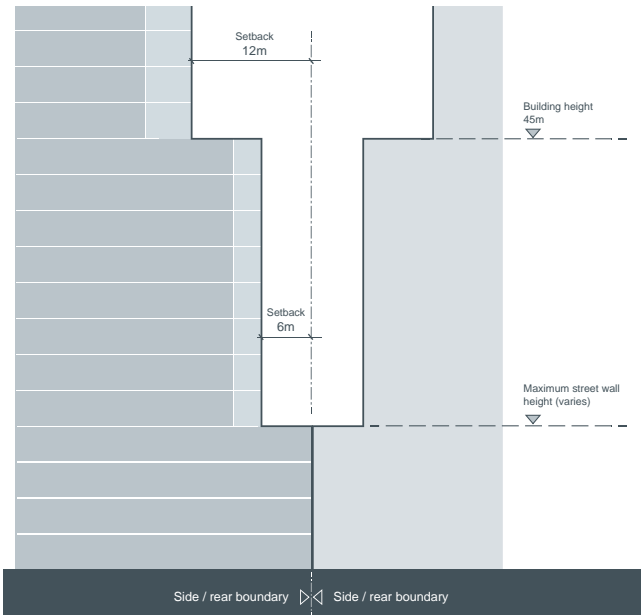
Section illustrating minimum side and rear setbacks for commercial buildings
